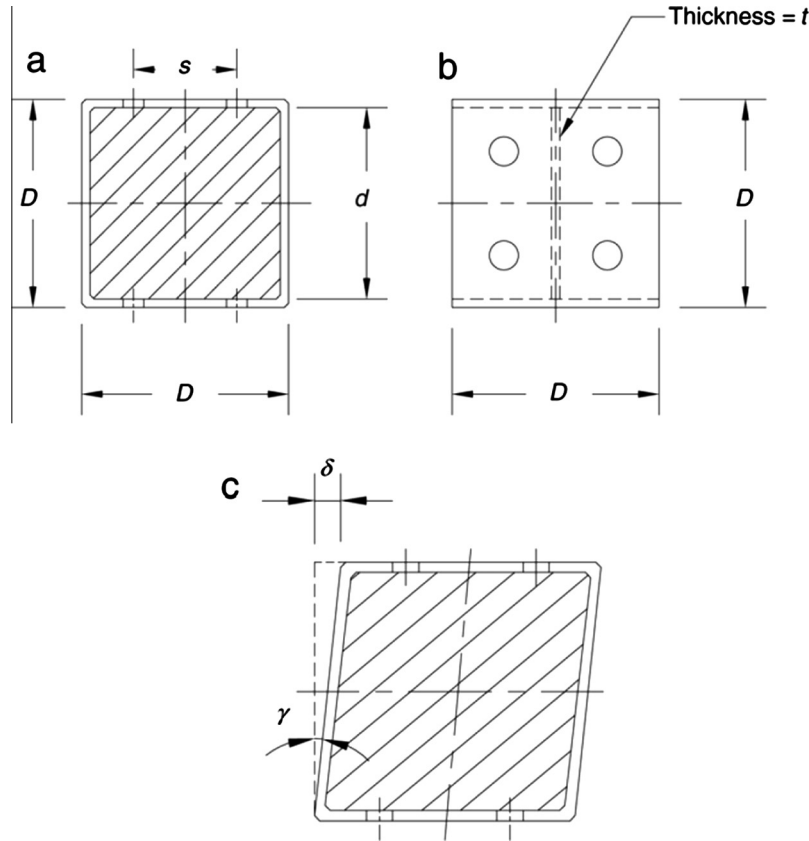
Design of the YSPD (a) elevation, (b) top view and (c) deformed shape.
